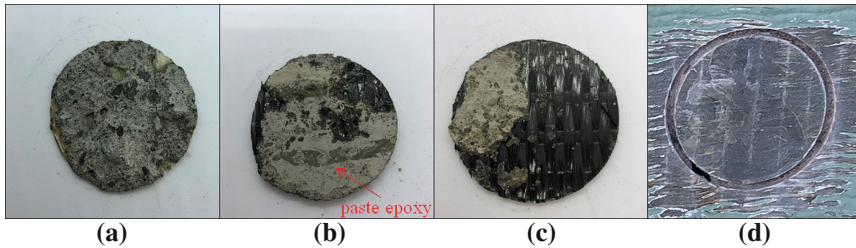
Typical bond pull-off test failure modes: a) cohesive failure in the concrete substrate, b) adhesive failure at the EBFPR/concrete interface, c) mixed adhesive and cohesive failure mode, and d) bonding adhesive failure at the fixture-EBFRP interface.
